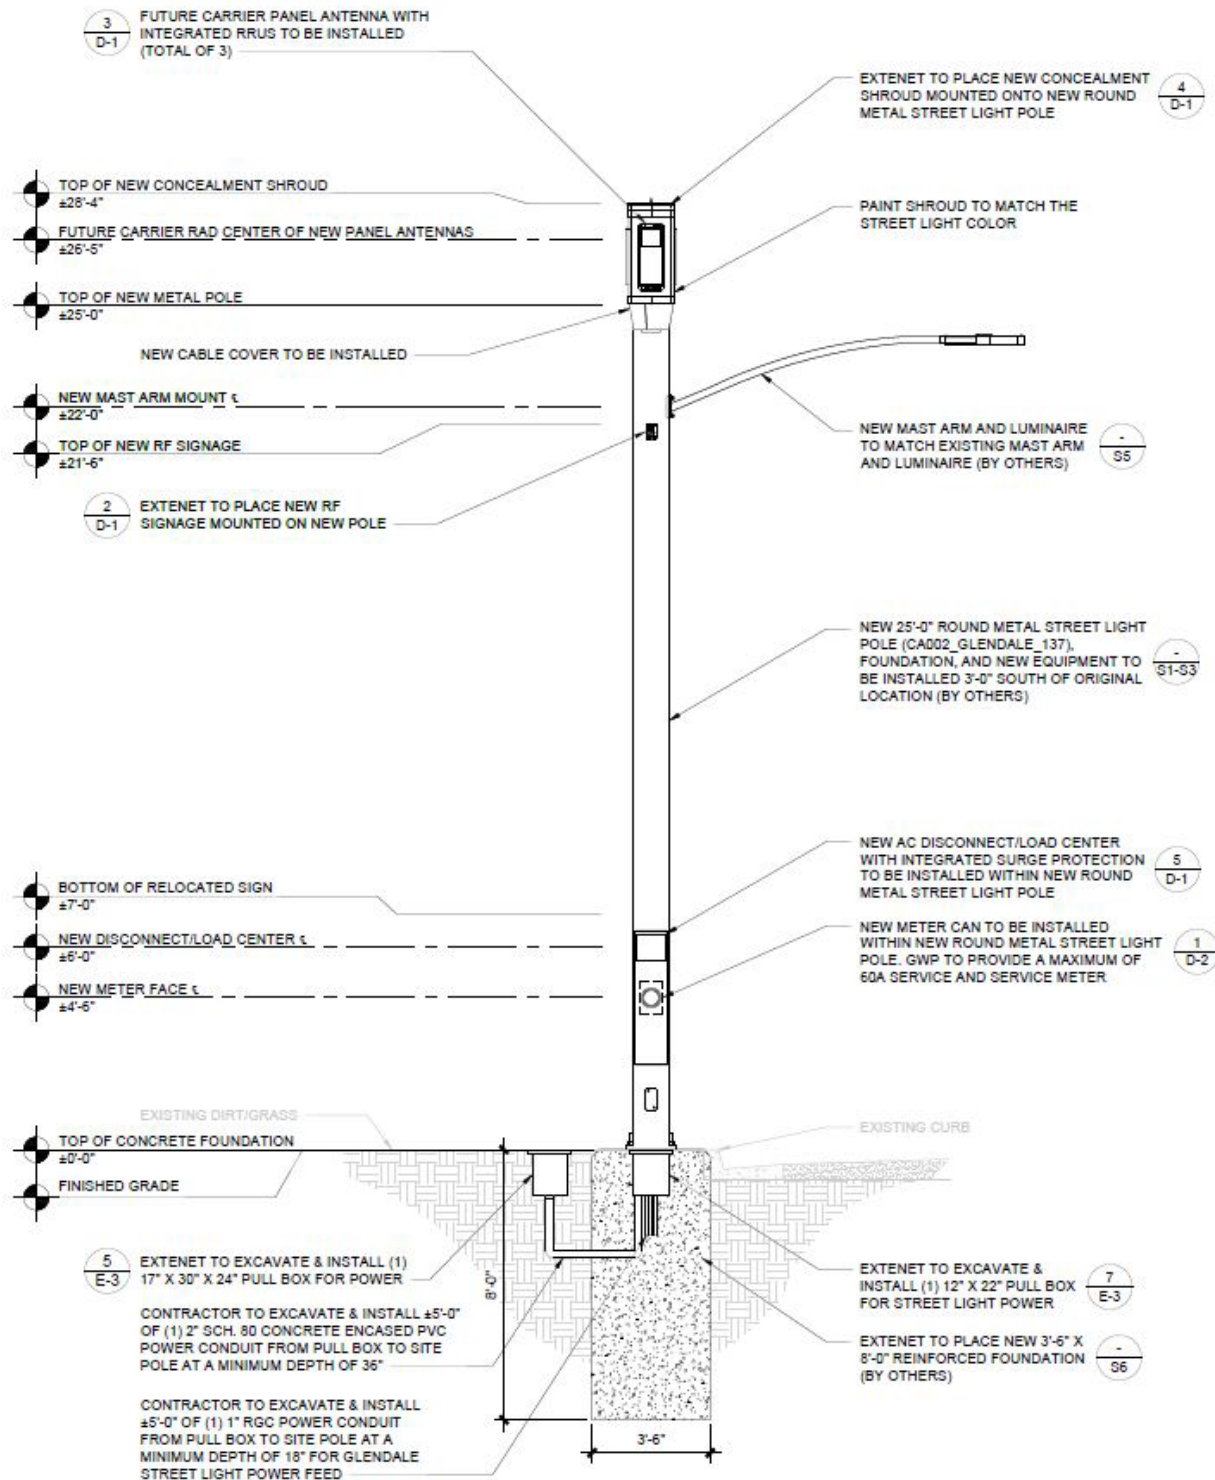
Elevation of the Pole (Source: Plans Page A3, Panel 2).
